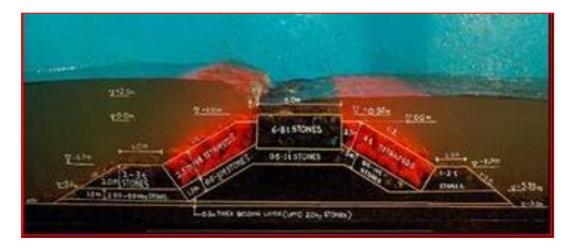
Wave action on the cross-section with tetrapods in the armour and stones in the crest
